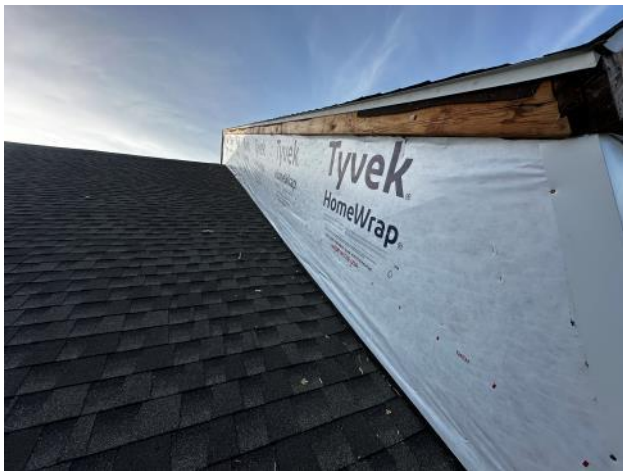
Overview of new Water Resistant Barrier (Tyvek) installed at a sidewall above the roofline.
